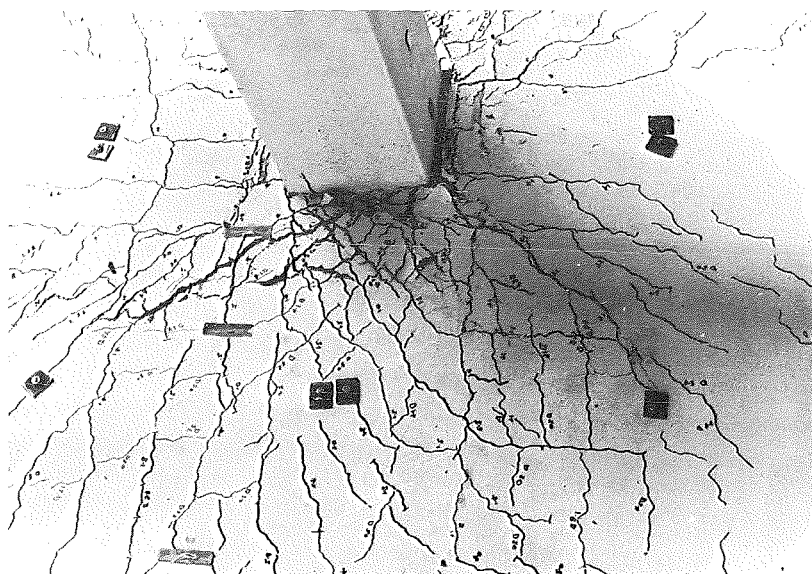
VIEW OF SPECIMEN 7CS AFTER TEST
